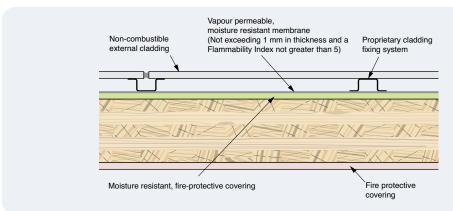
Fire-protected massive timber external wall with external lightweight cladding.
